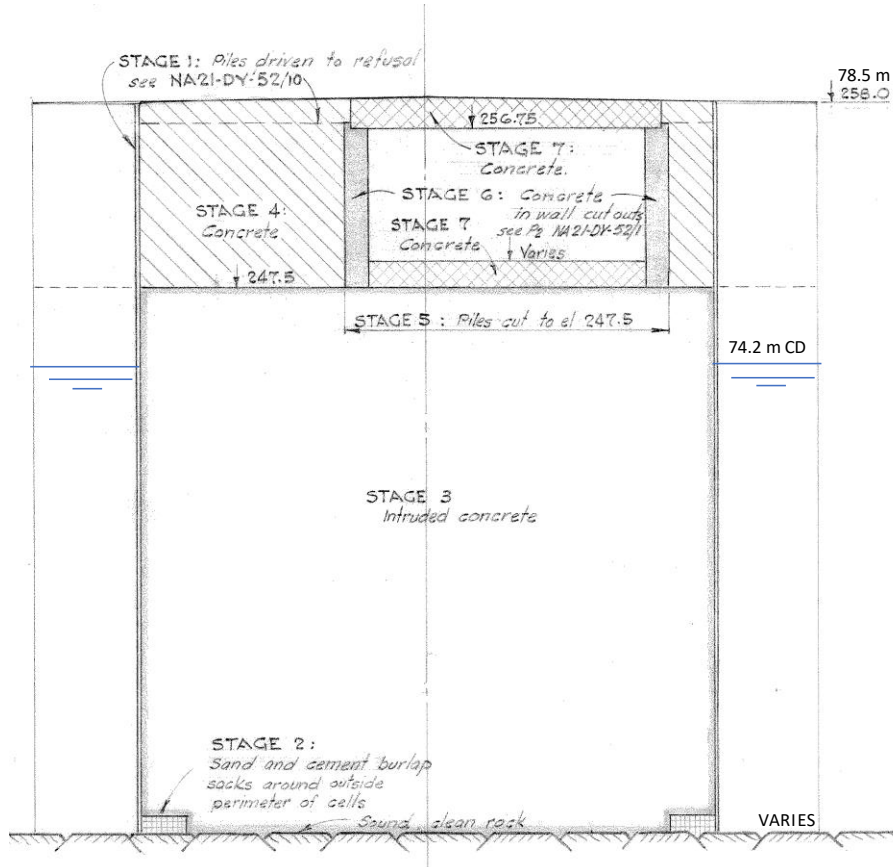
Cross-section of Western Pier at arc with interior tunnel for conveyer system
